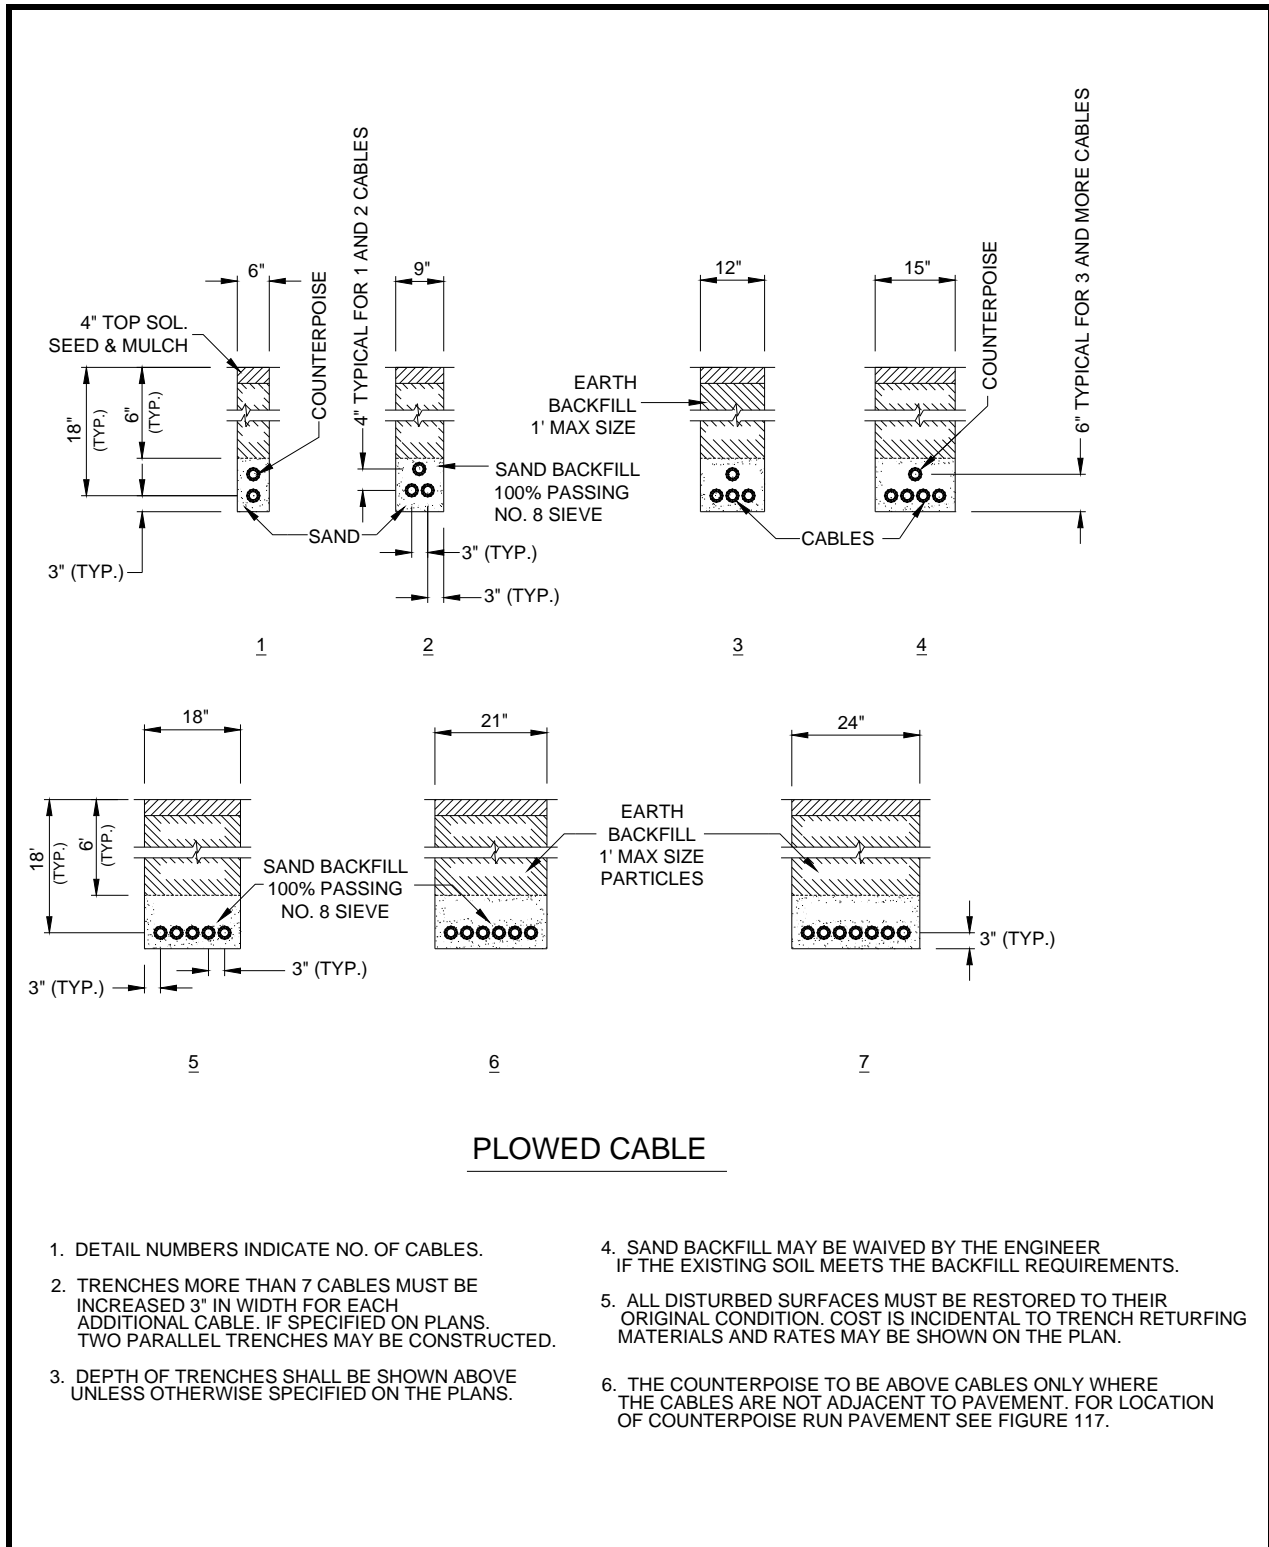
Standard Details for Underground Cable Installation – Plowed Cable.
